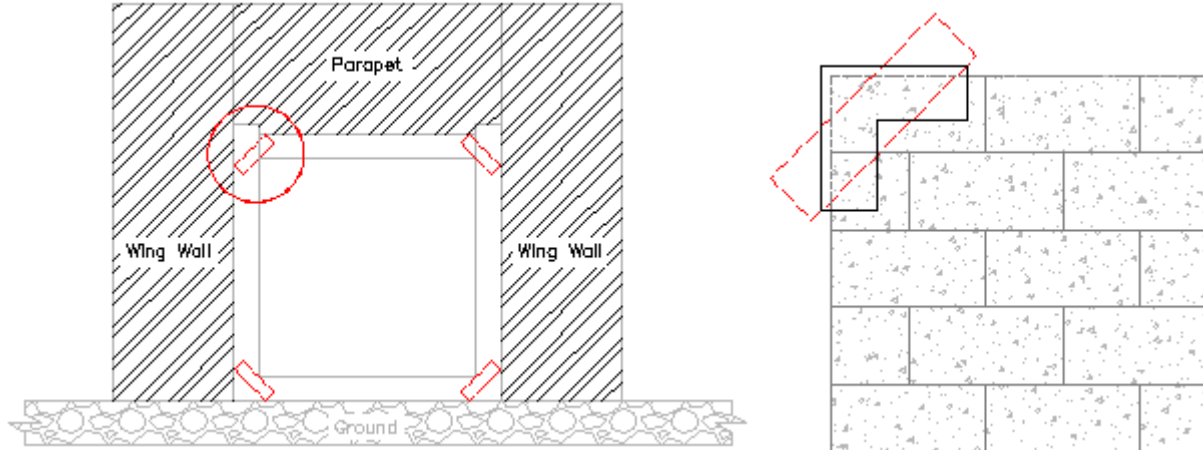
Blast Bunker: a) View from Charge Centre; b) Wall Connection Detail
